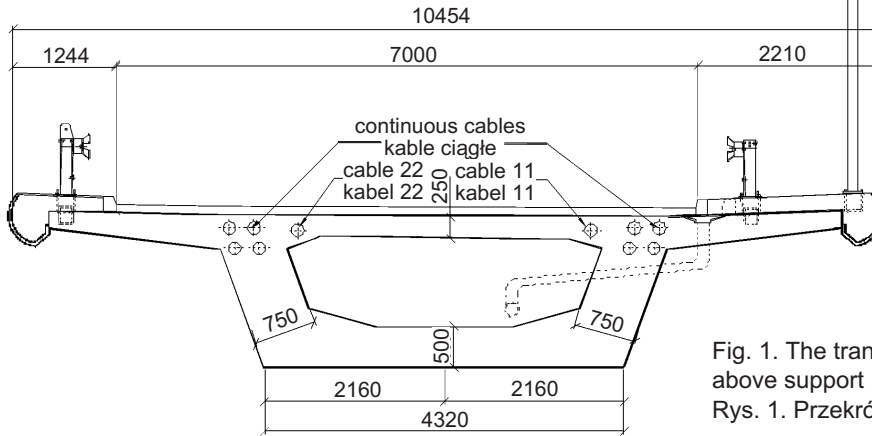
shows the transverse cross-section and Fig. 2 shows the longitudinal cross-section of a span over the support No. 5 in the area where failure occurred. These figures present the route of a section of cable No. 22 above support No. 5, which failed.
